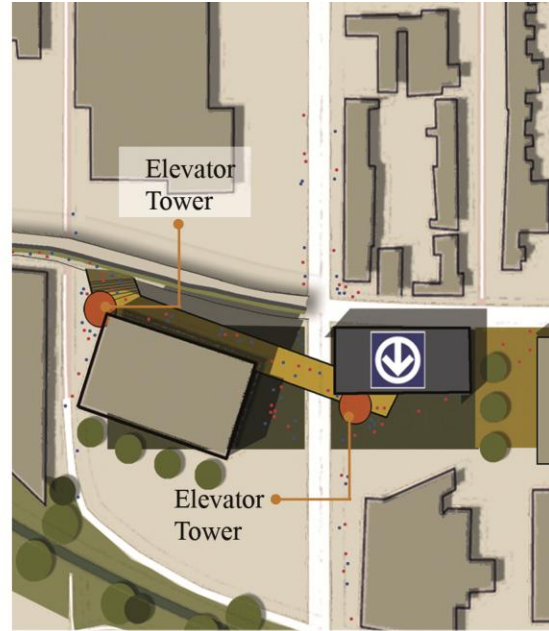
The new bridge will make the passage safer and more convenient. Two towers of staircases and elevators will access the bridge for all pedestrians and cyclists.
